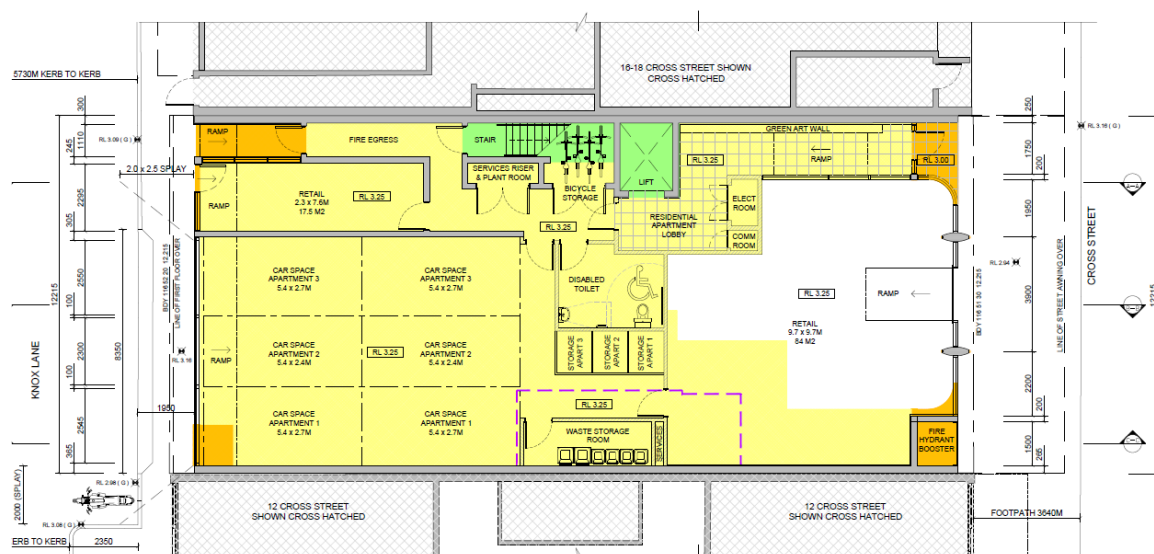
Amended mirror reversed ground floor plan showing addition of retail space facing Knox Lane and reduction of parking to three sets of tandem car spaces.
